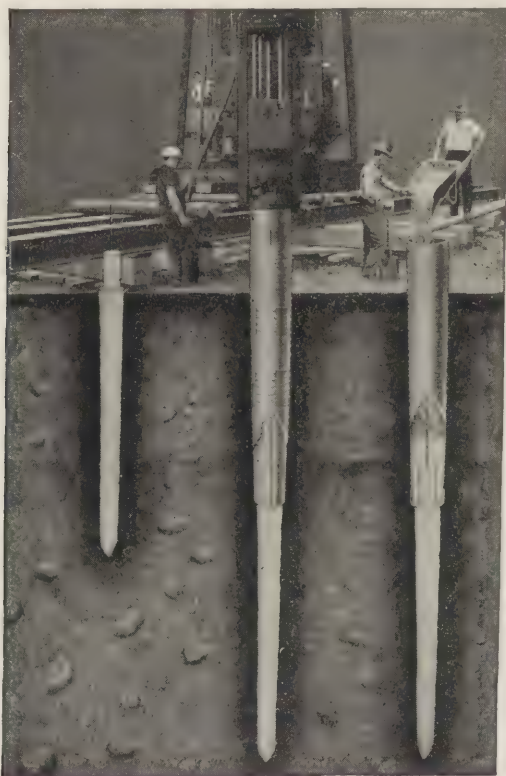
Raymond Composite Pile—Wood and Concrete.
